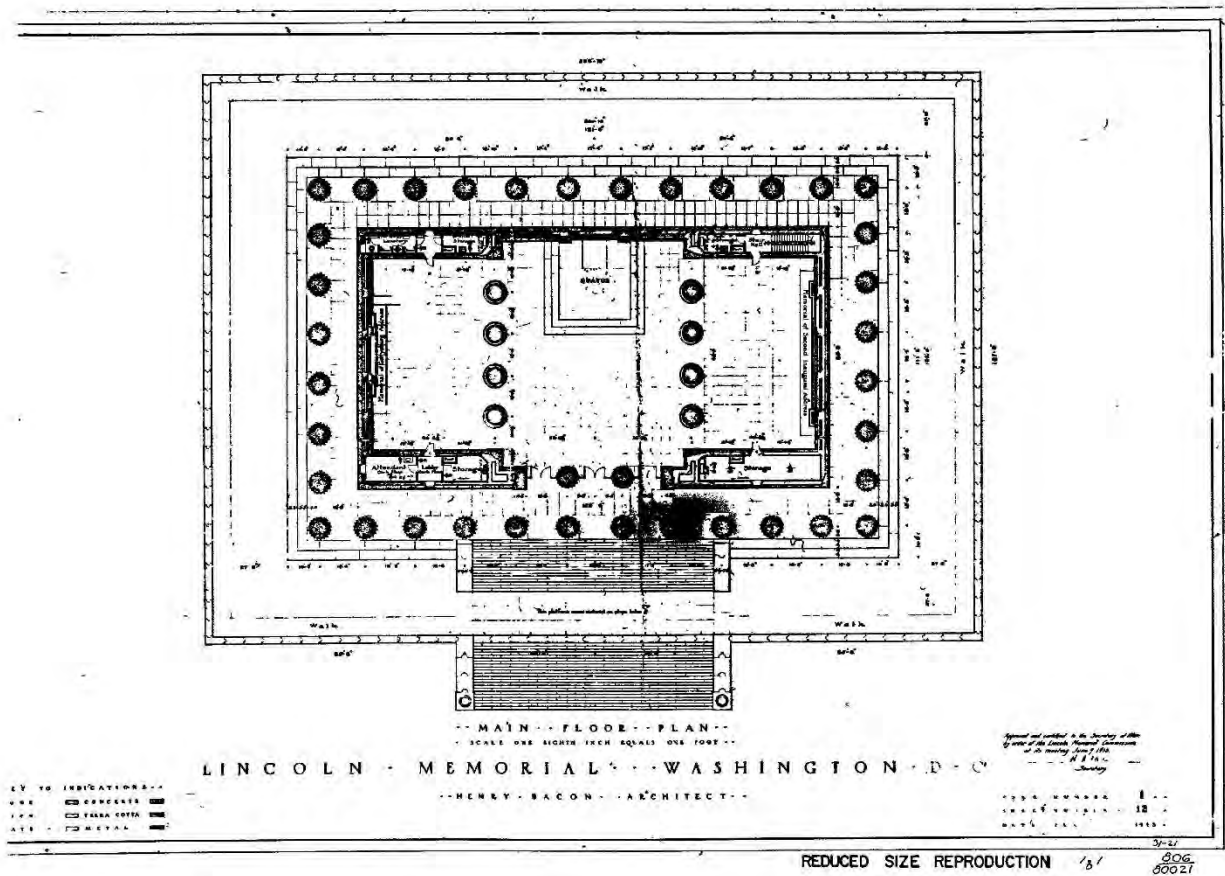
Floor plan for the Lincoln Memorial structure as of 1915. (Bacon 1915a)
